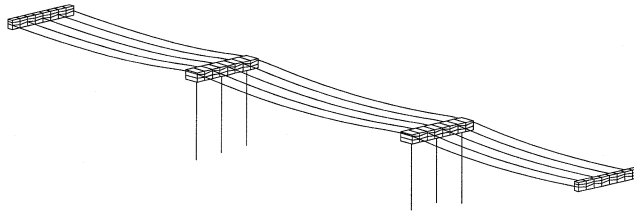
Column-to-superstructure connection modeling detail.
